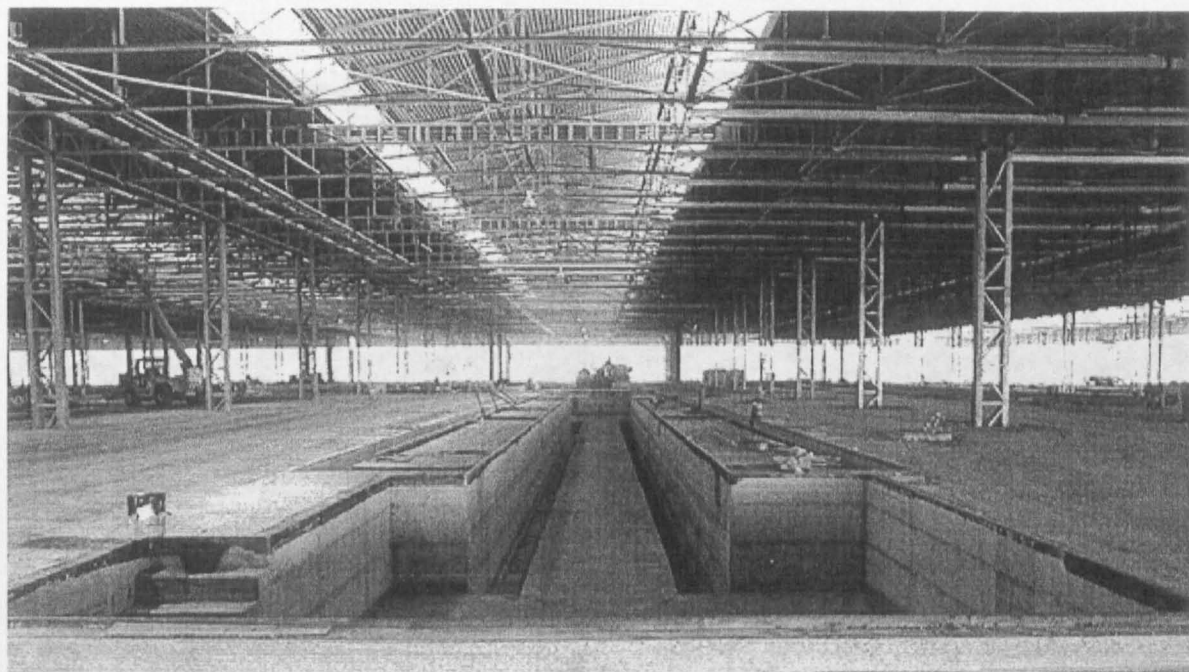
Construction work: the body welding unit (September 1992)
